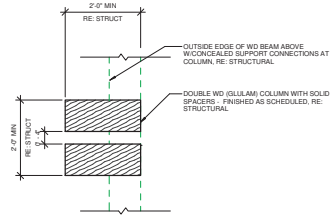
DETAIL-PLAN-WD-CORNER-FRAMING-TYP 1
